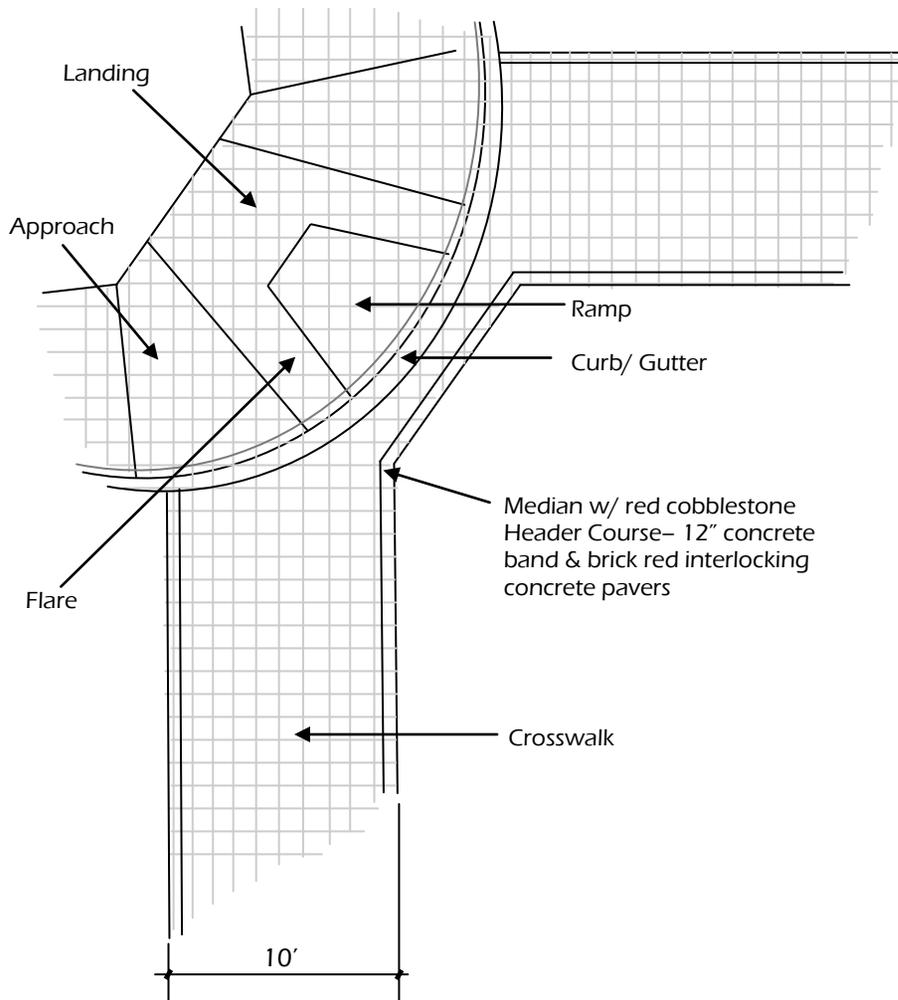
Paved crosswalks at the intersection of El Camino Real, Prospect Avenue, and First Street should be paved with brick colored interlocking concrete pavers.
